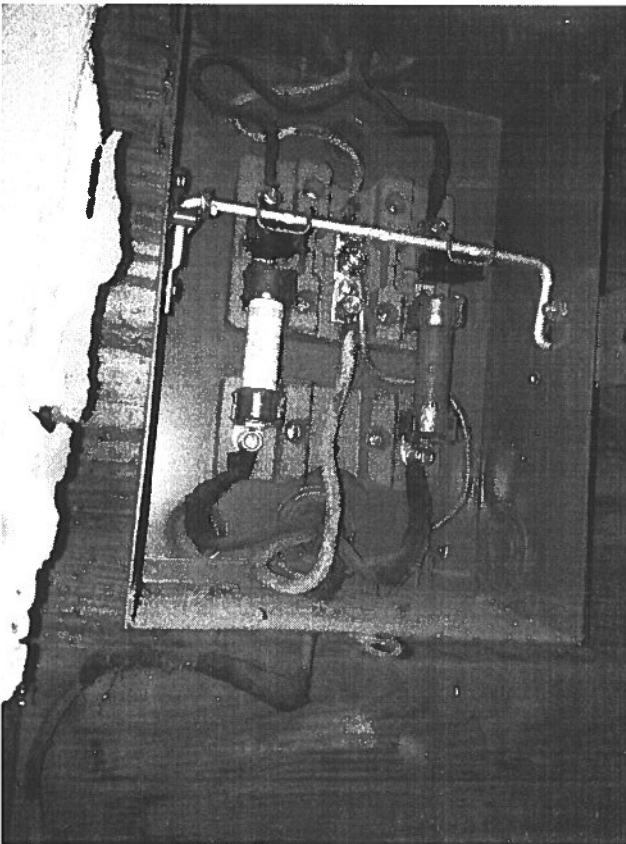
Common Ground and Neutral in Fuse Box. Different Size Fuses on Each Circuit
